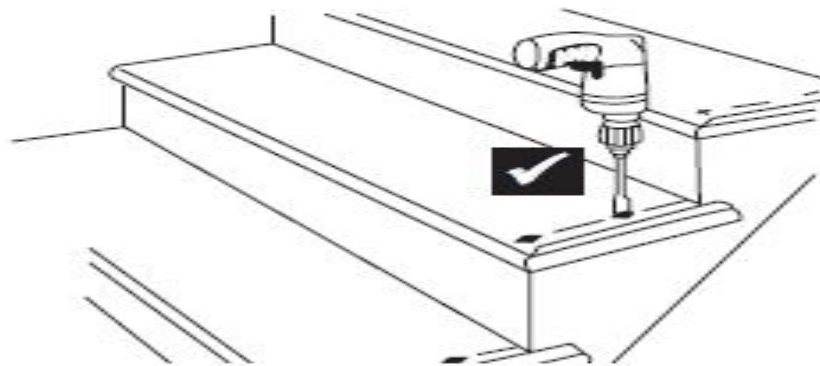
MARK STAIR FOR INSTALLATION O. BALUSTERS ON OPEN STAIRCASE.
